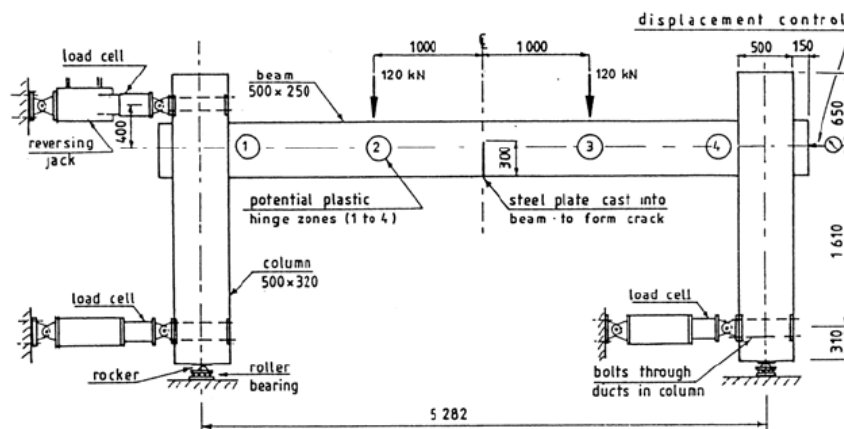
Reinforced concrete portal frame specimen tested by Megget and Fenwick (1989).
